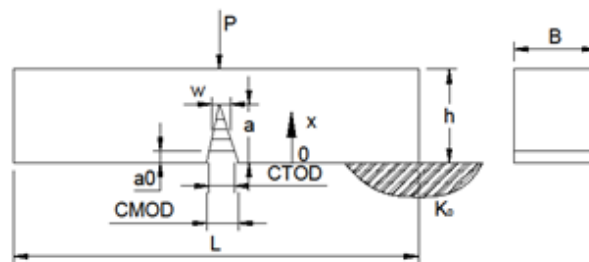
Steel fibre-reinforced PMC notched beam on elastic foundation subjected to a central point load
